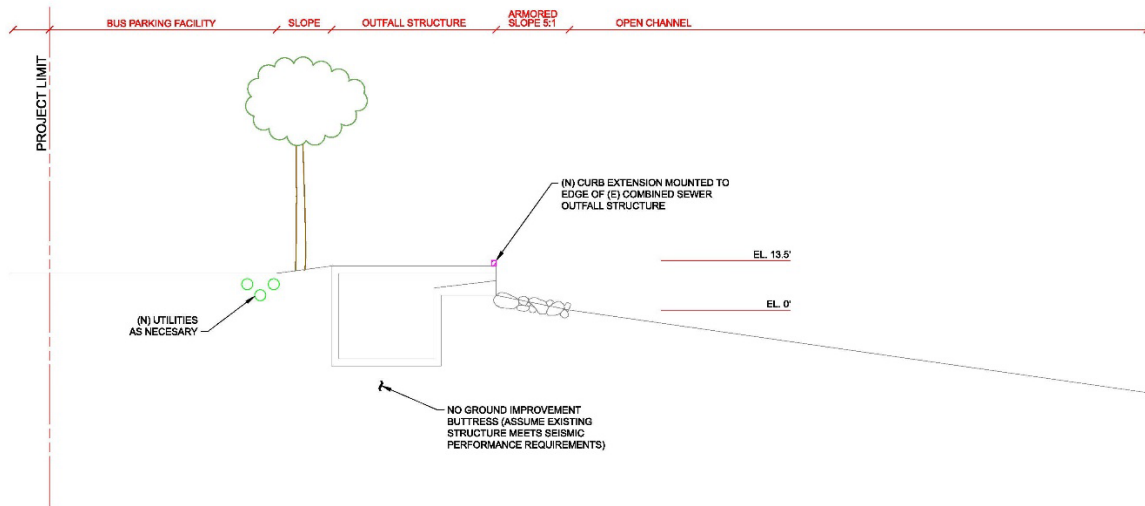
Section 12 Recommended Plan (Reach 4, Pier 80)
